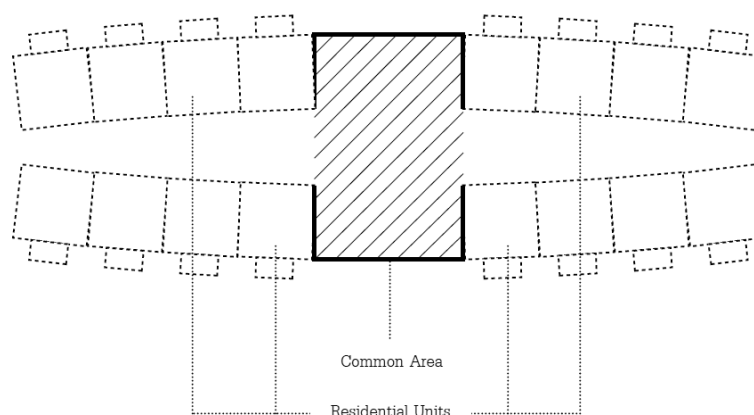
A schematic of one floor of a building with residential units located next to the common area.
